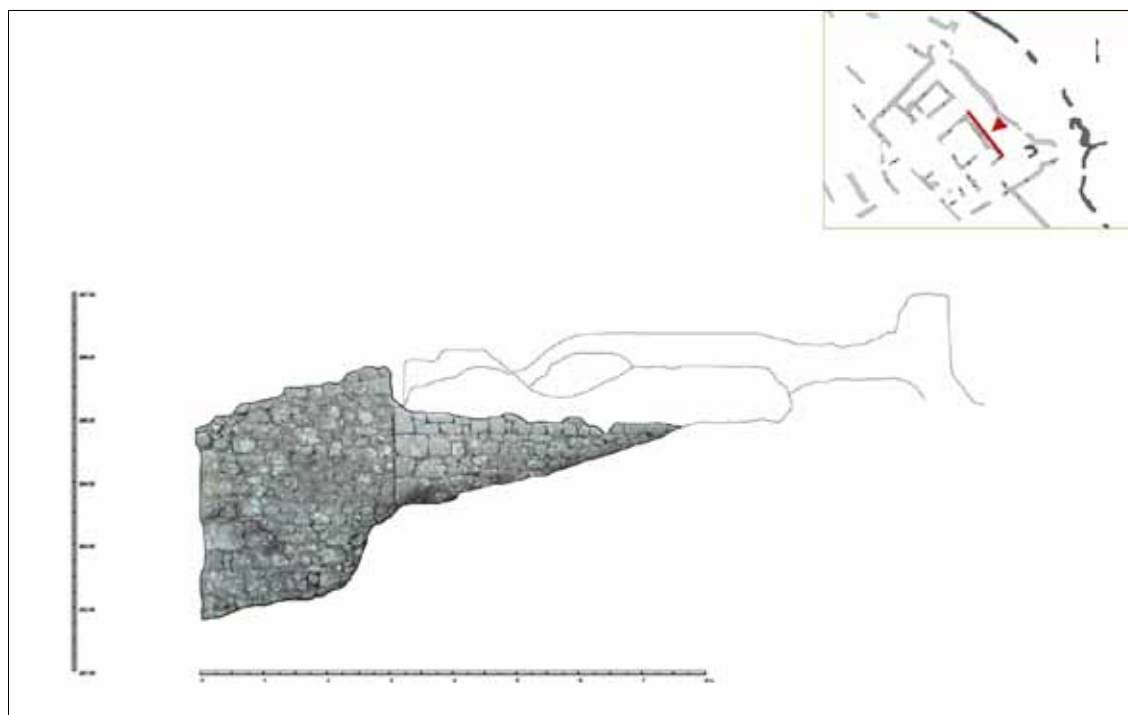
Masonry fabric of walls SU 1002 (CP2) and SU 1003 (CP3). (Plan by: Valdir).
